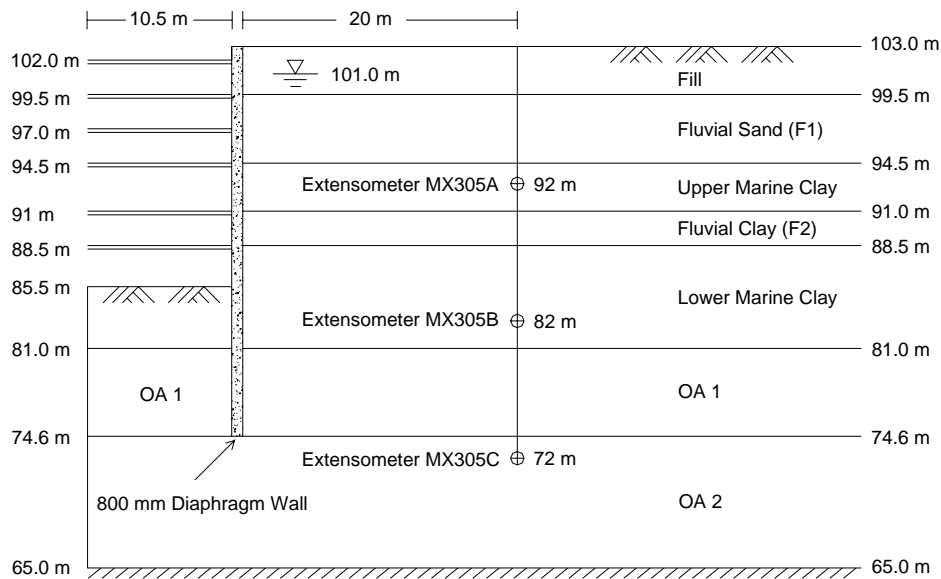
Cross Section at Cut-and-Cover Tunnel between Farrer Park and Kandang Kerbau (CH31+895)
